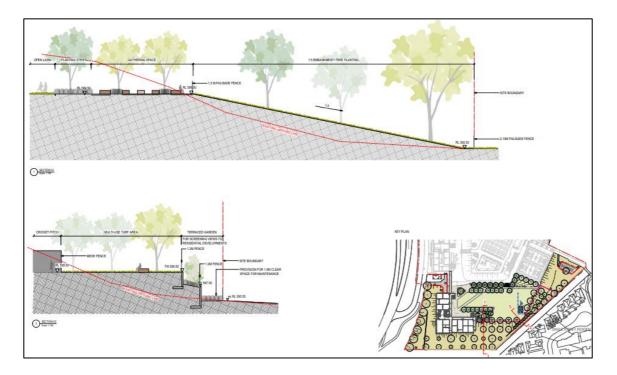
LANDSCAPE SECTIONS 1 & 2
